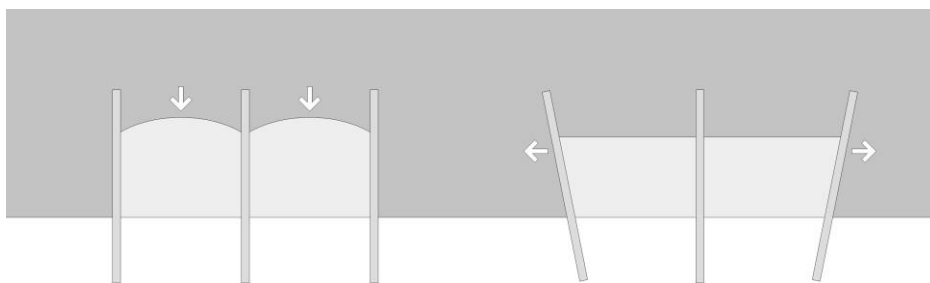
The load of the earth tilts the walls of the palisades. Source: original work
